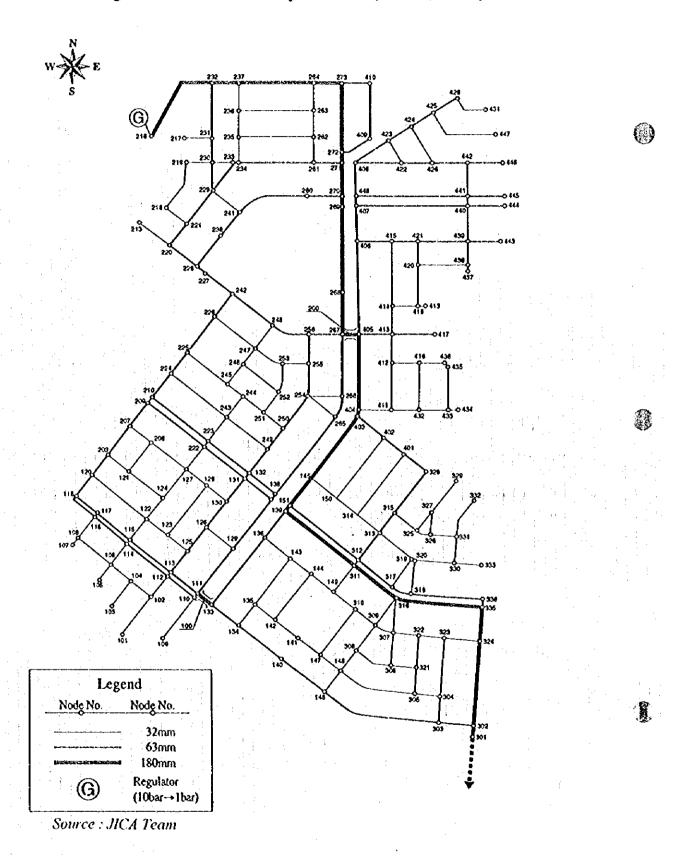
Distribution Pipeline Plan (Area I, South)
